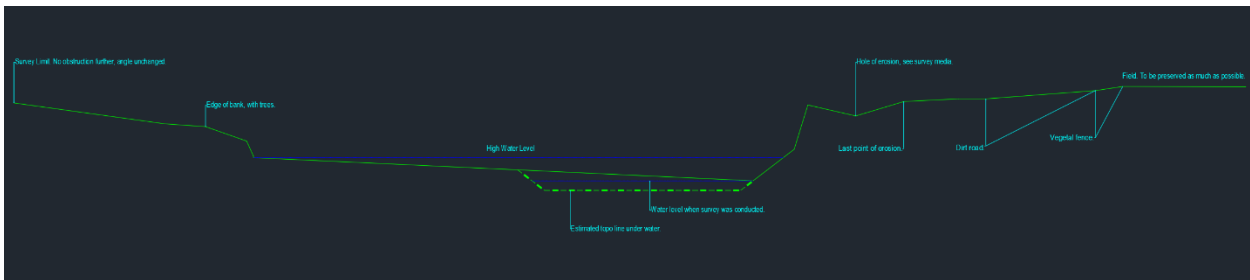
Suspended Bridge Condition Sheet (Created by Technical Team)
